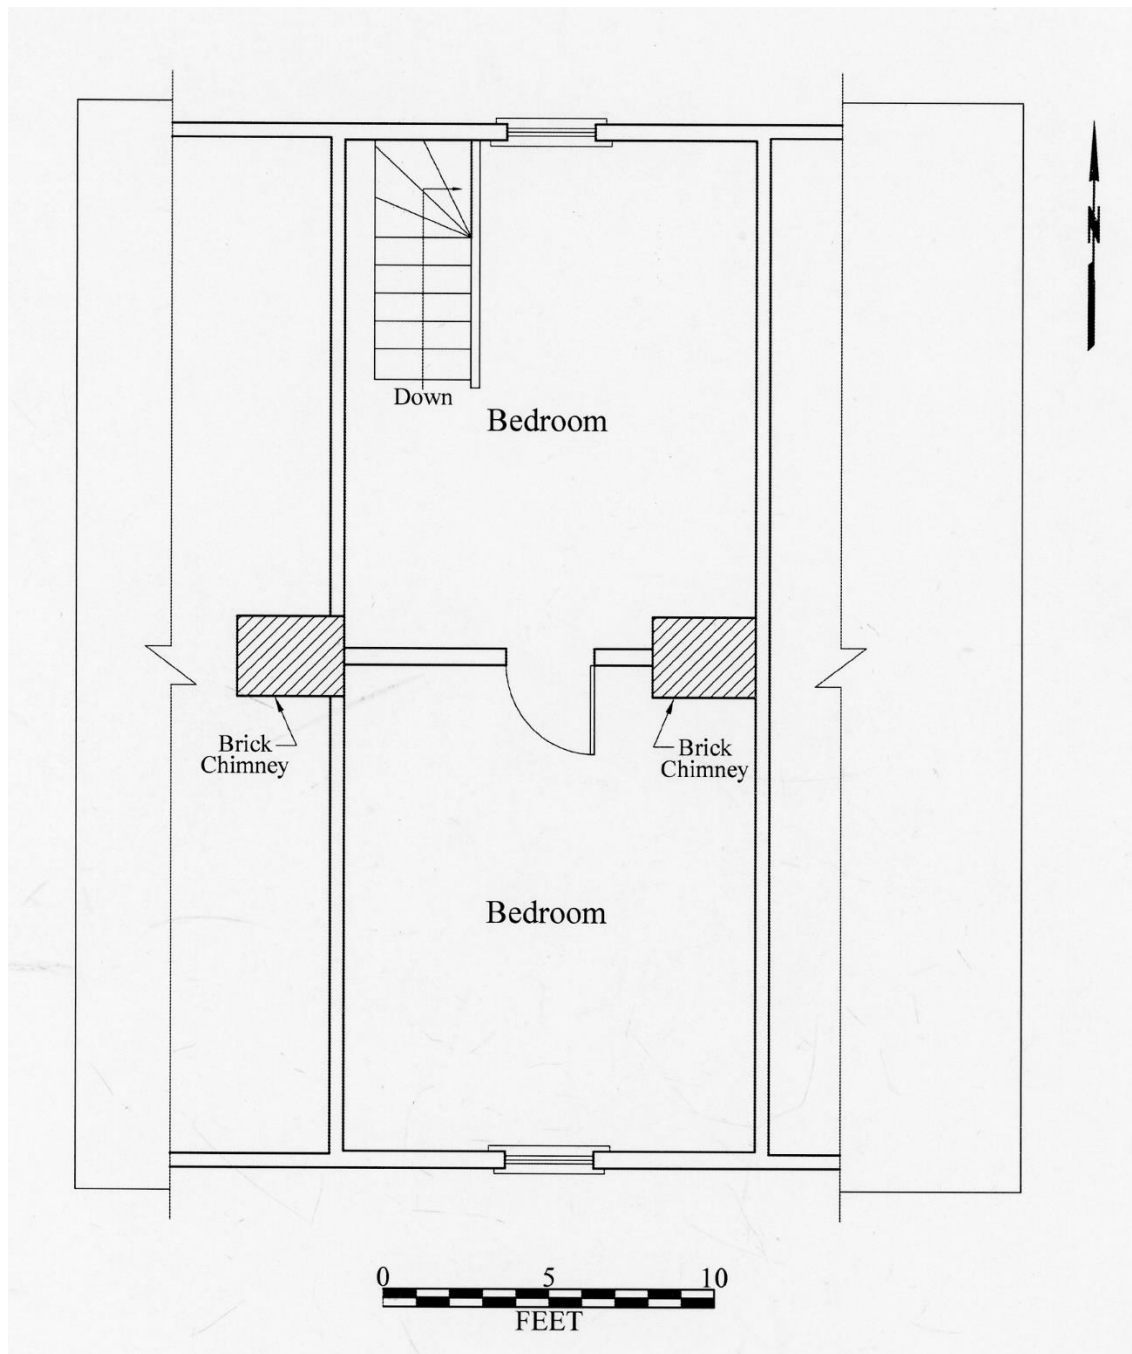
Possible layout of the upper story of House D—assuming that it did indeed have a usable upper floor. It is possible that the upper floor consisted of just one large room, though the space easily could have accommodated two rooms. A two-room layout also seems likely once the house was divided into two multiple living units.
